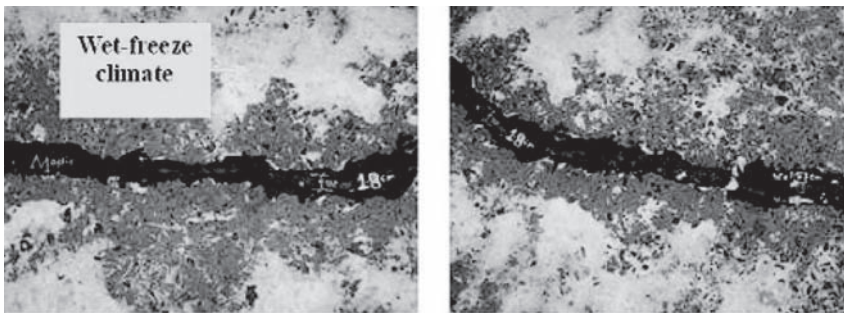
Joint sealant installation section at irregular crack of a roadway in HIT campus; SJS2 type.
